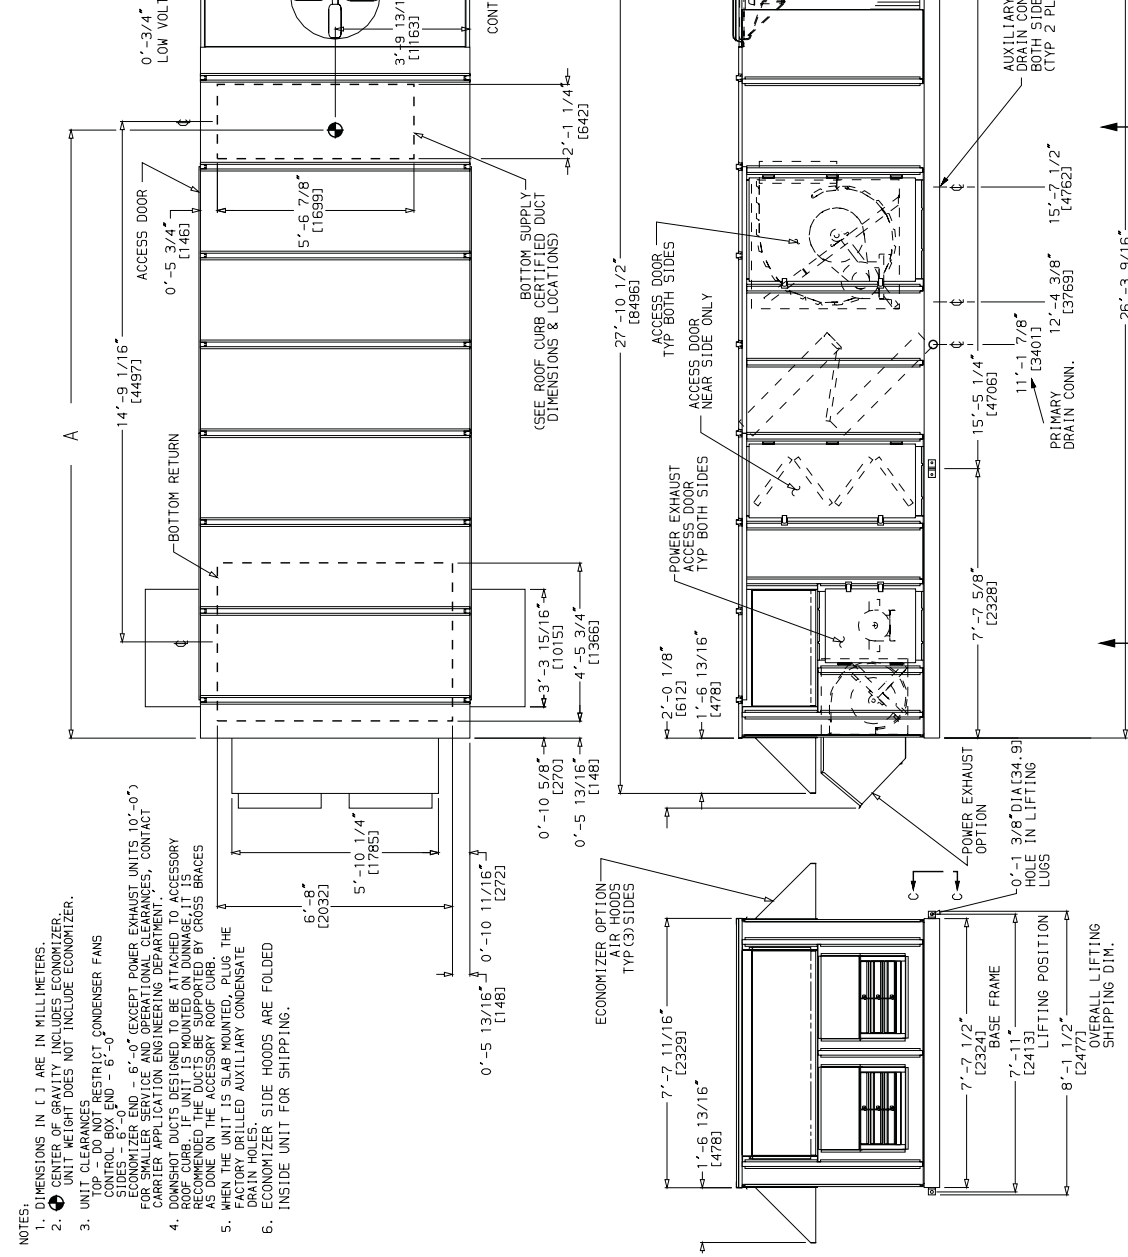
Base Unit Dimensional Drawing — 50ZG,ZN075-105 (Standard Chassis)
